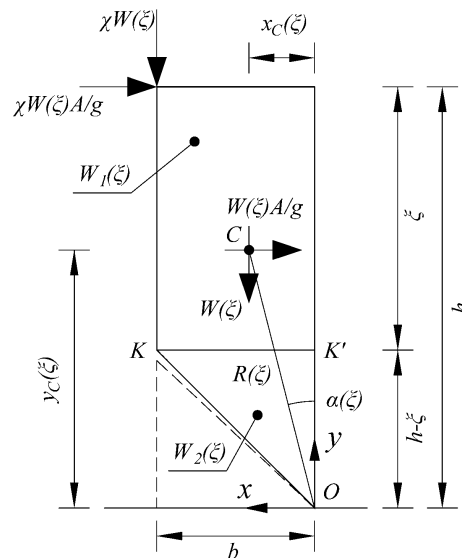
Forces acting during the rocking of the cracked wall pier.
